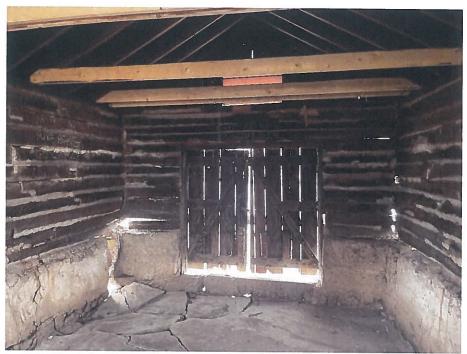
Cracked concrete floor and door on the West elevation
